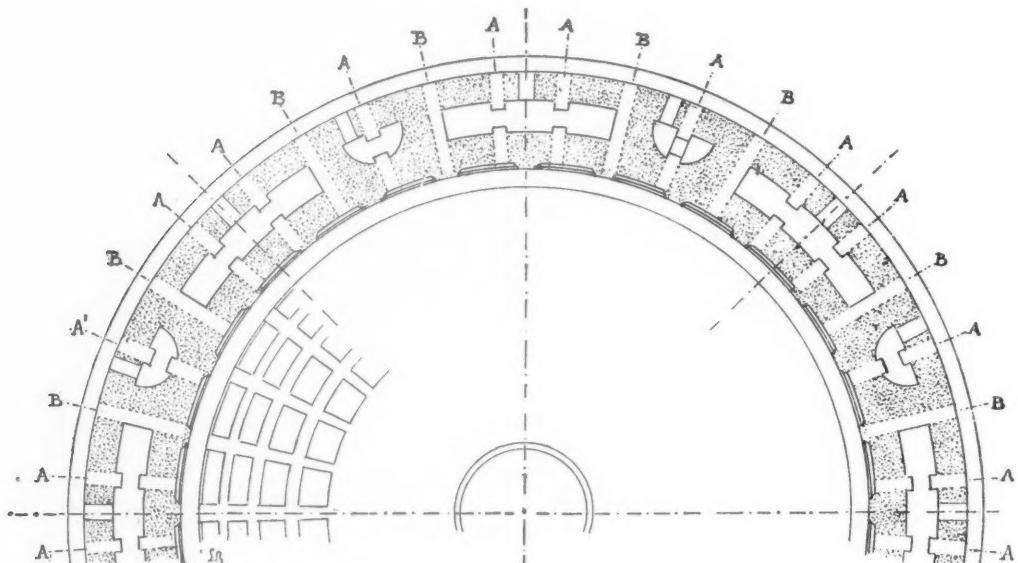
THE PANTHEON: PLAN AT SPRINGING OF DOME
